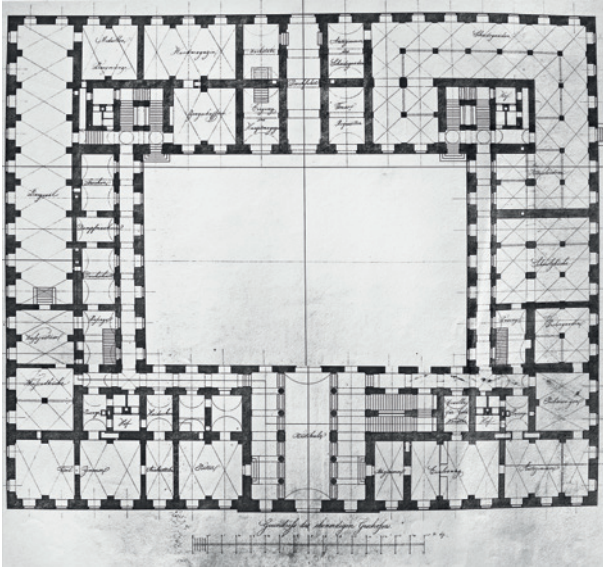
Vienna Central Mint, ground plan of the ground floor, 1844, OeStA AVA PKF PS II A-II-c/88.
